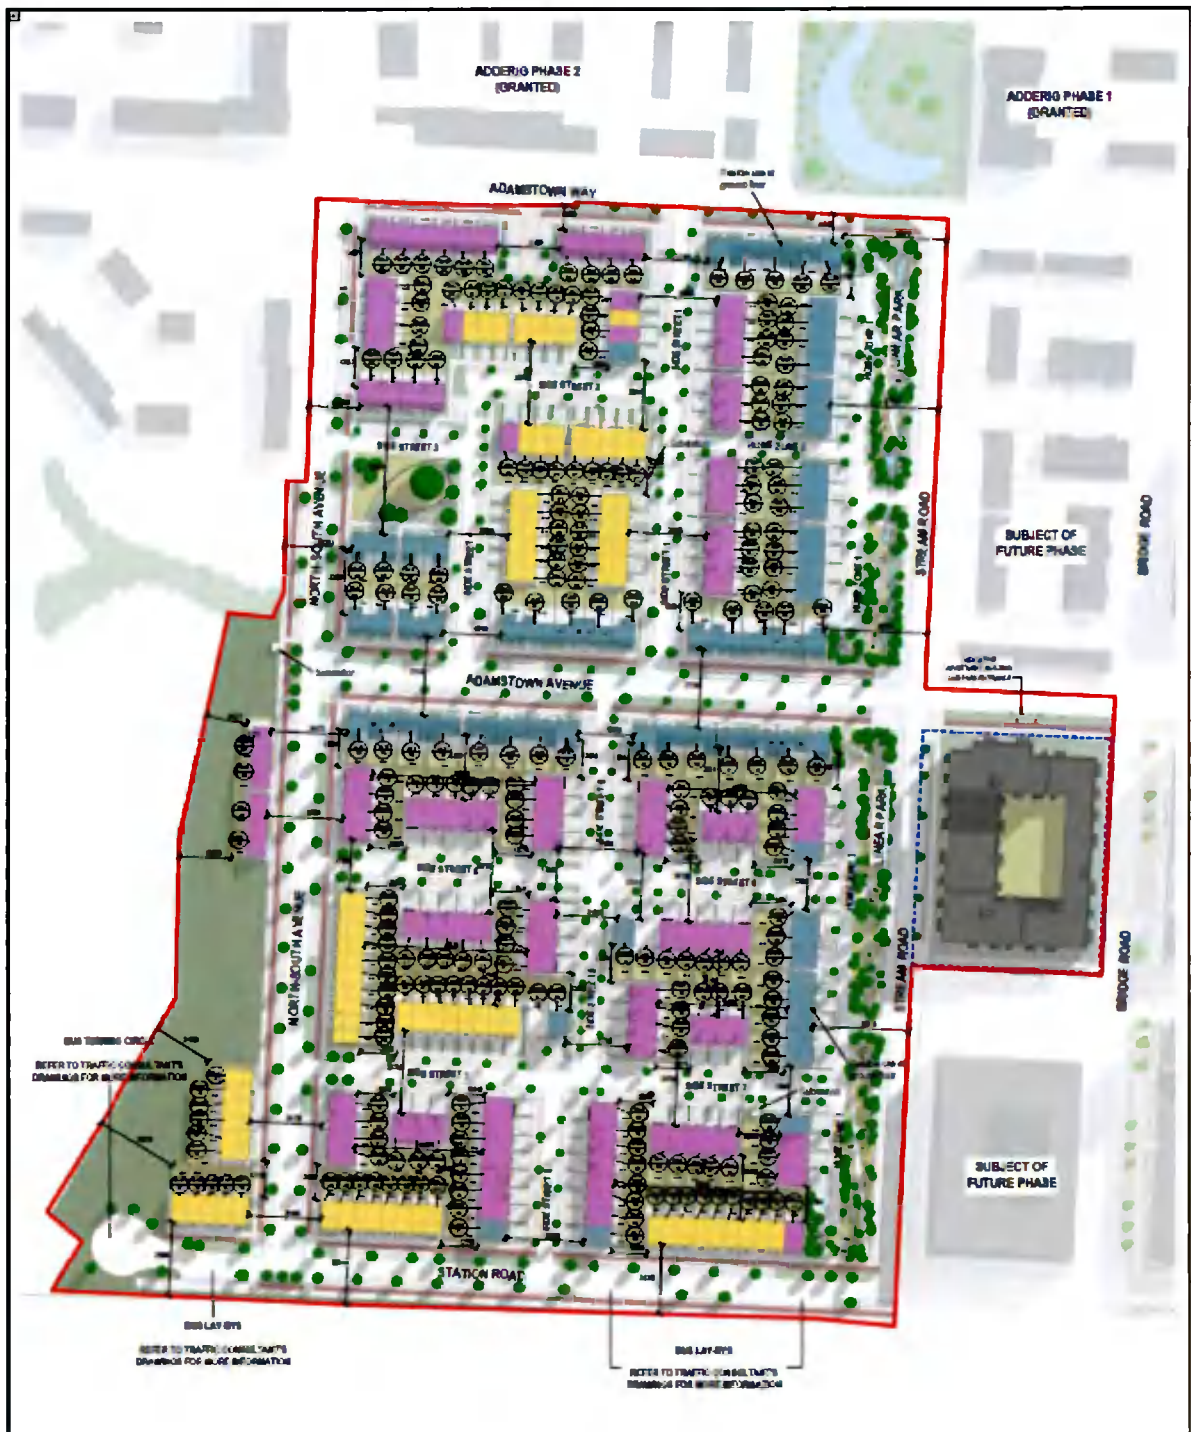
Adamstown Boulevard – proposed development layout (Source: Architect’s documents)
